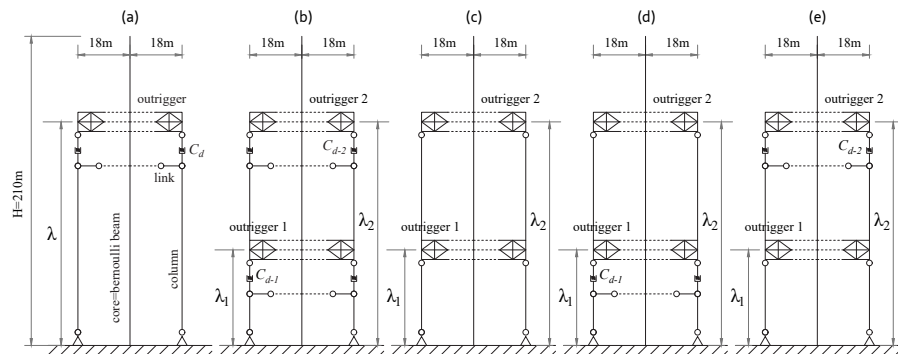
Analytical outrigger building models: (a) single damped; (b) double damped; (c) double fixed; (d) combined damped and fixed; and, (e) combined fixed and damped.
